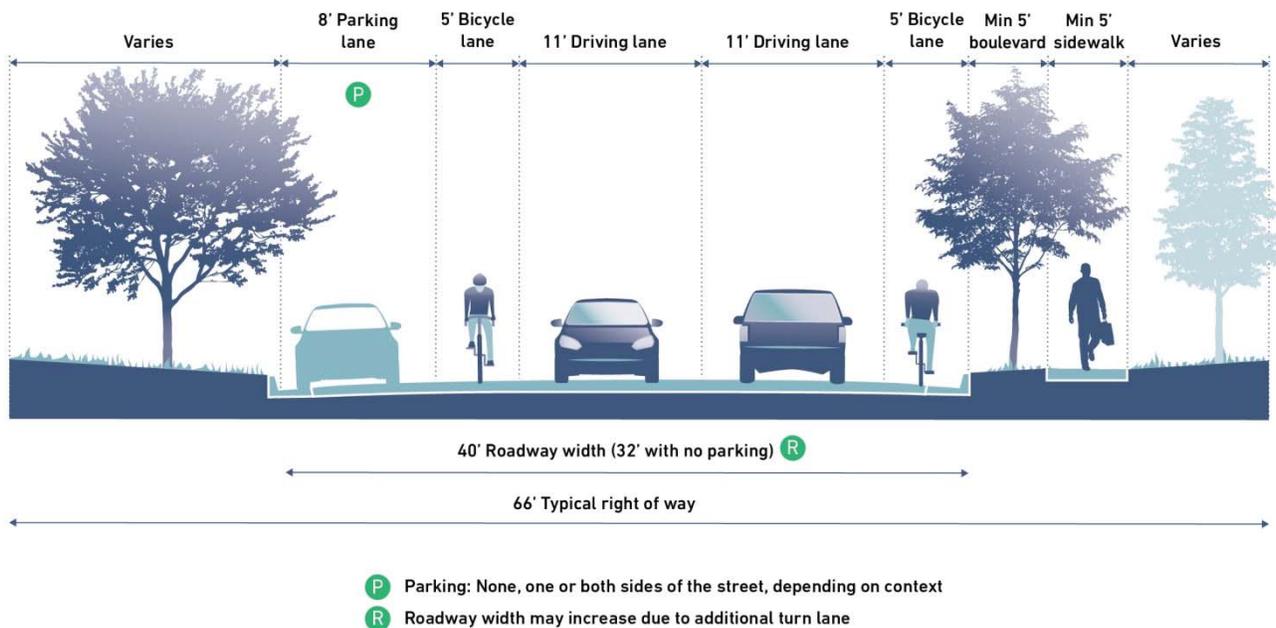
FIGURE I – PROPOSED COLLECTOR STREET TYPICAL SECTION
